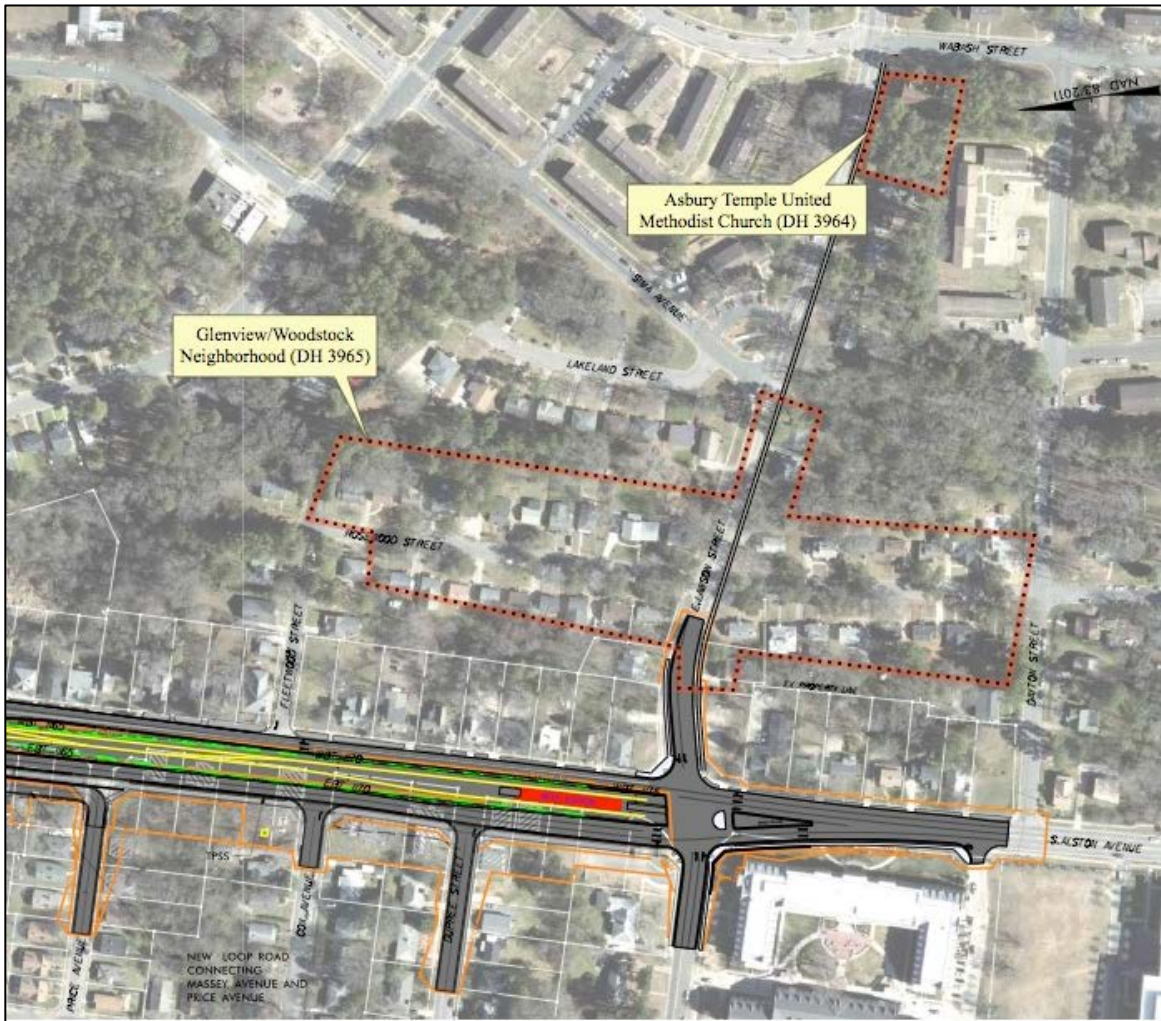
Location of Asbury Temple United Methodist Church (DH 3964) in Proximity to Proposed Project Refinements
